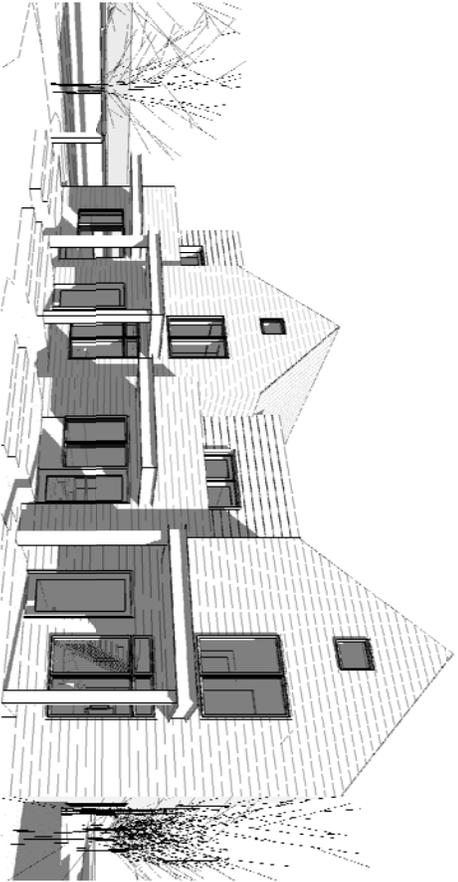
Exhibit B - Multi-Unit Dwelling Architectural Drawings
